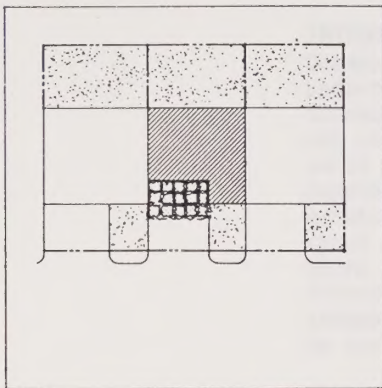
B.2-5. Useable open space over garage and second-floor living space over first-floor dwelling front.
